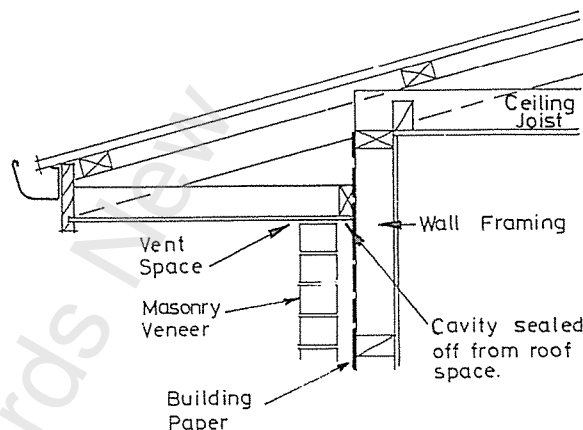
Venting and sealing of cavities between masonry veneer and timber stud walls
